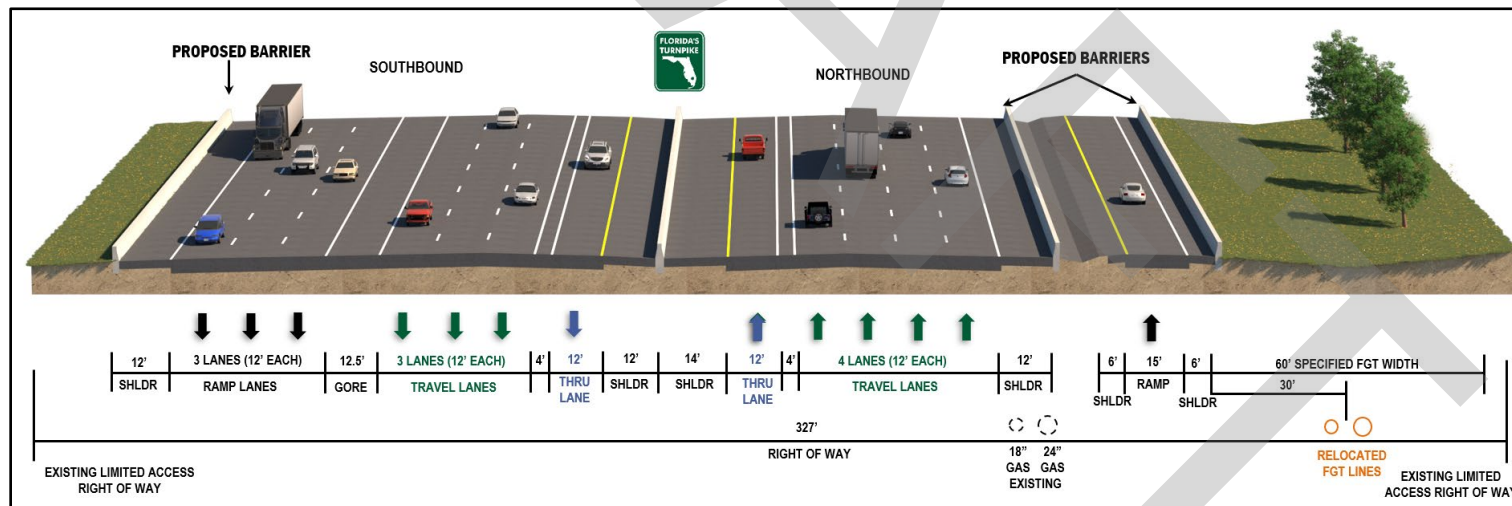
Preferred Alternative Roadway Section between Wiles Road and Sawgrass Expressway
